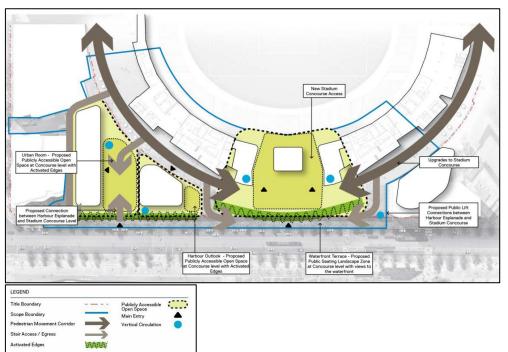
Publicly Accessible Open Space and access / egress points from Harbour Esplanade to the concourse (source: Applicant's Development Envelope Drawings associated with the Master Plan)
